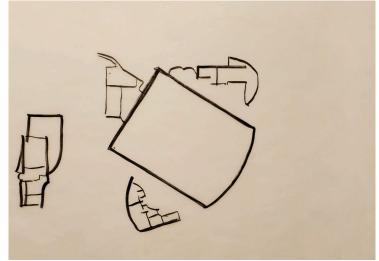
AUTHOER'S SKECTH OF THIRD FLOOR PLAN
